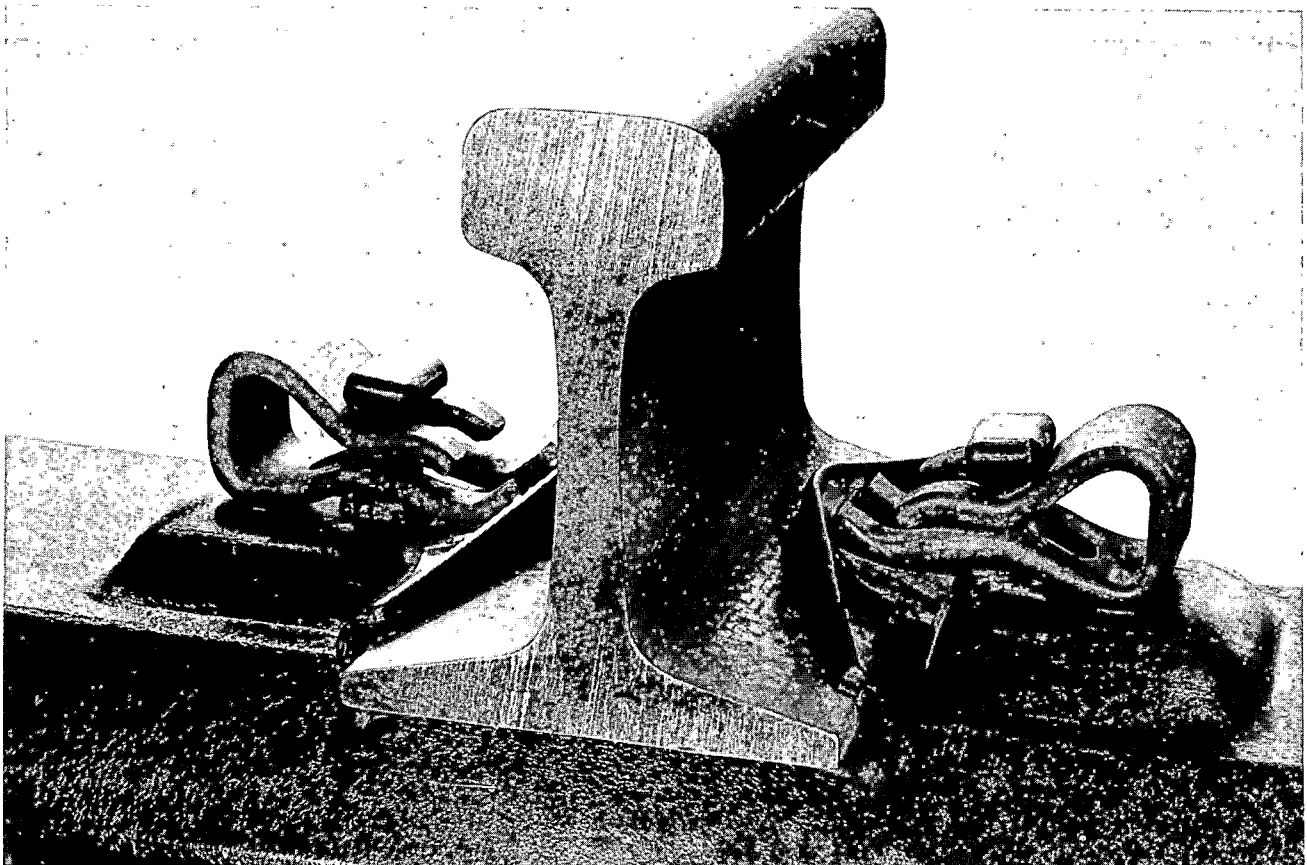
The Heavy Haul Steel Sleeper with Traklok Fastener and Pad
